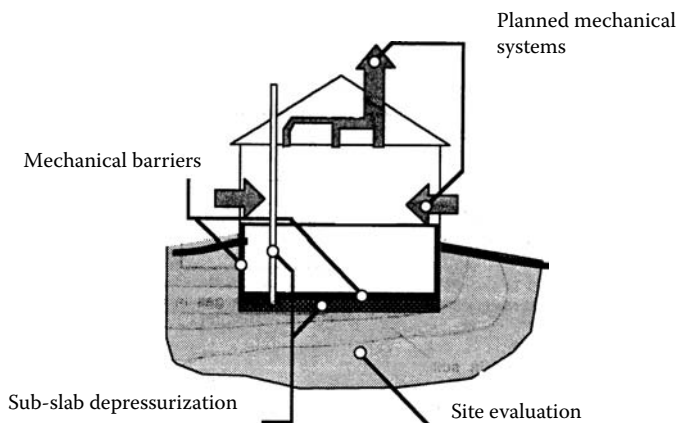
Major radon-resistant new construction topics. (Adapted from U.S. EPA, *Radon-Resistant Construction Techniques for New Residential Construction—Technical Guidance*, EPA/625/2-91/032, U.S. Environmental Protection Agency, Washington, DC, February 1991.)
